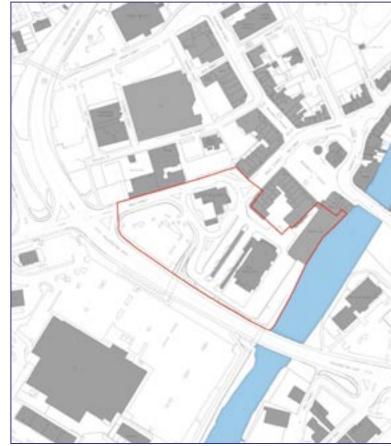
site plan (not to scale) - a scaled plan is attached to the document
